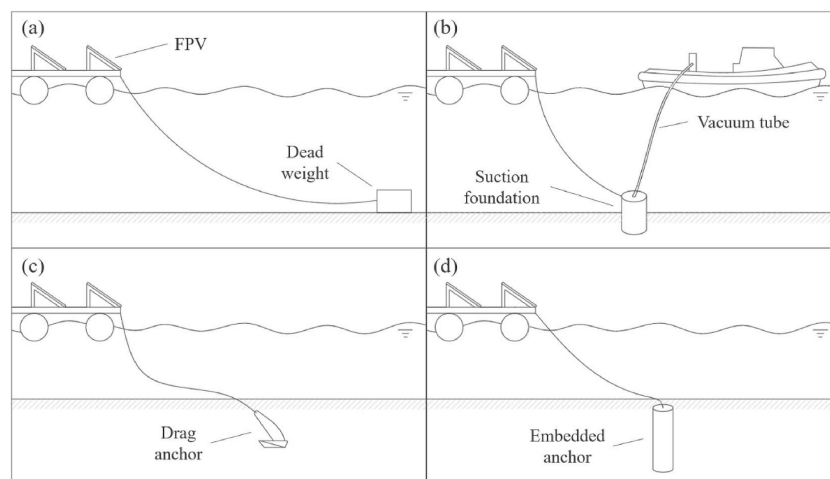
Anchoring systems for the marine environment layouts for FPV systems (a) dead weight, (b) suction foundation, (c) drag anchor, (d) embedded anchor (Claus and López, 2022).
